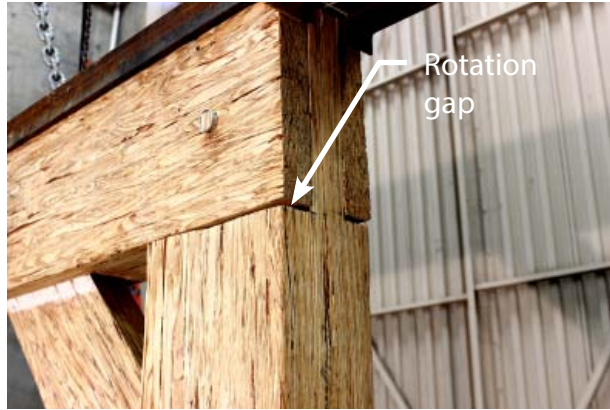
Beam to column connection rotation, frame at 1.92 inches of lateral deflection.
